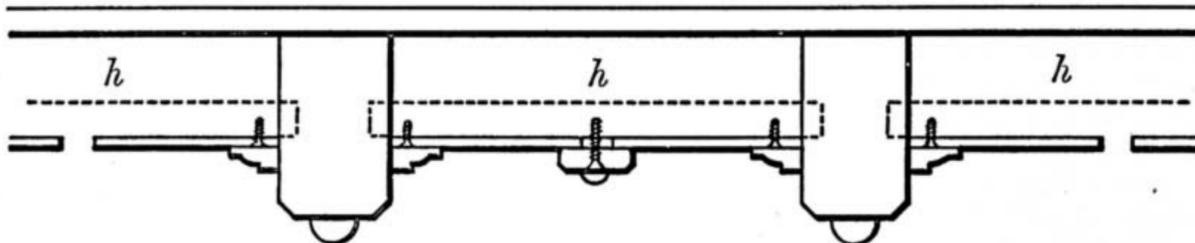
Wood Ceiling. Section, showing Space contrived under Floor for Packing.
